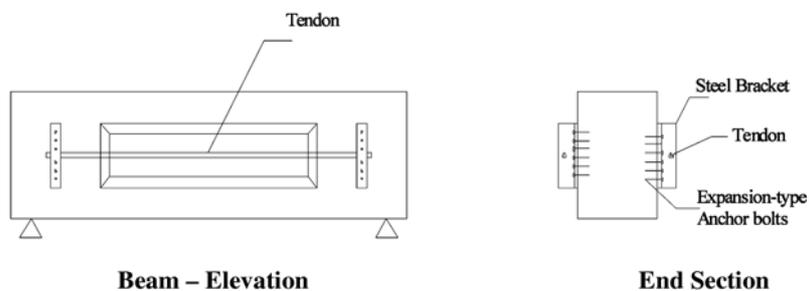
Anchoring of EP at the sides with expansion-type anchor bolts
